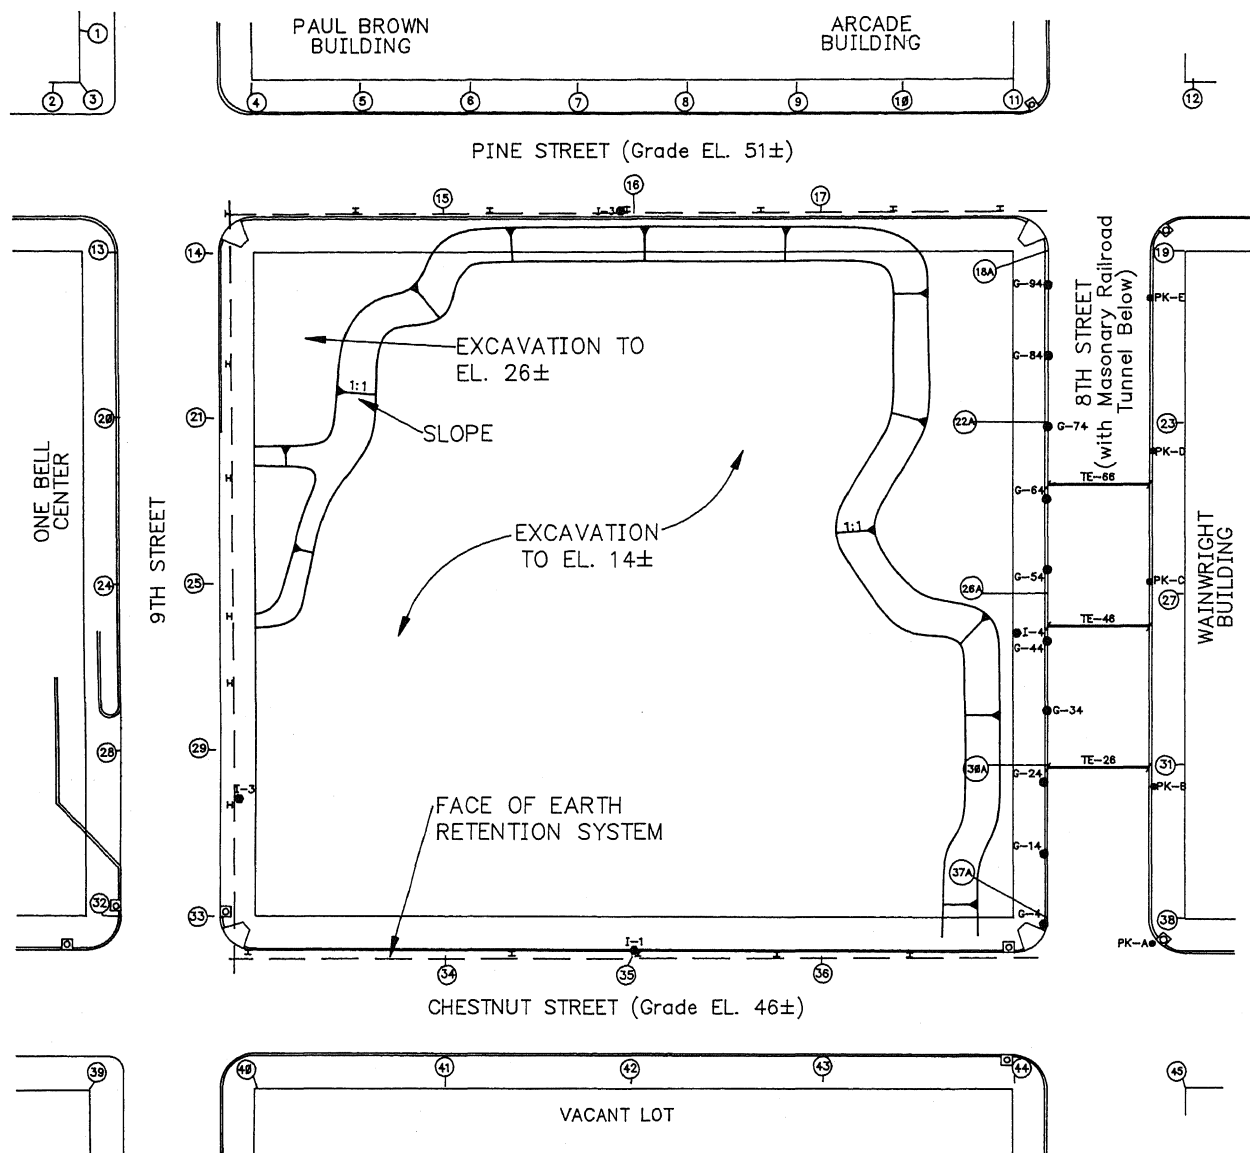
Site Plan Showing Earth Retention System and Instrumentation
